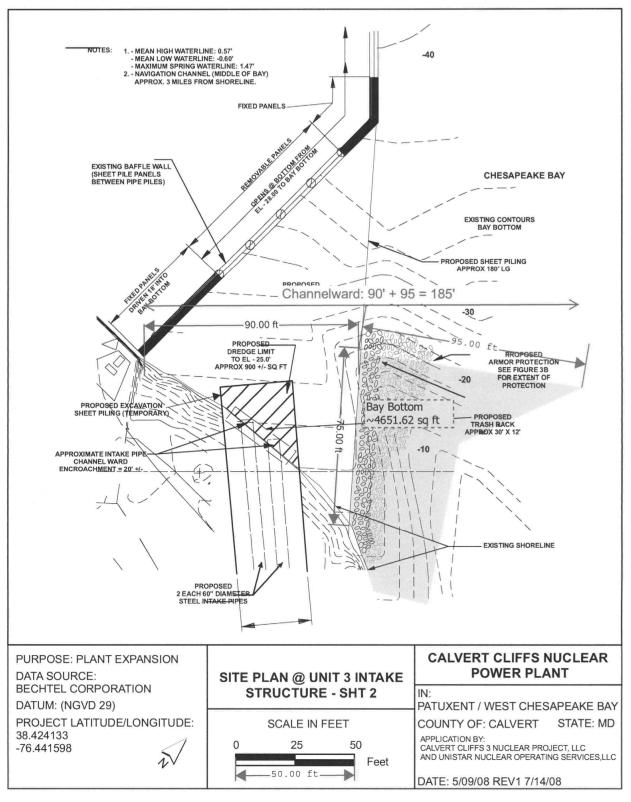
Site Plan at the Unit 3 Intake Structure (UniStar 2009d)
